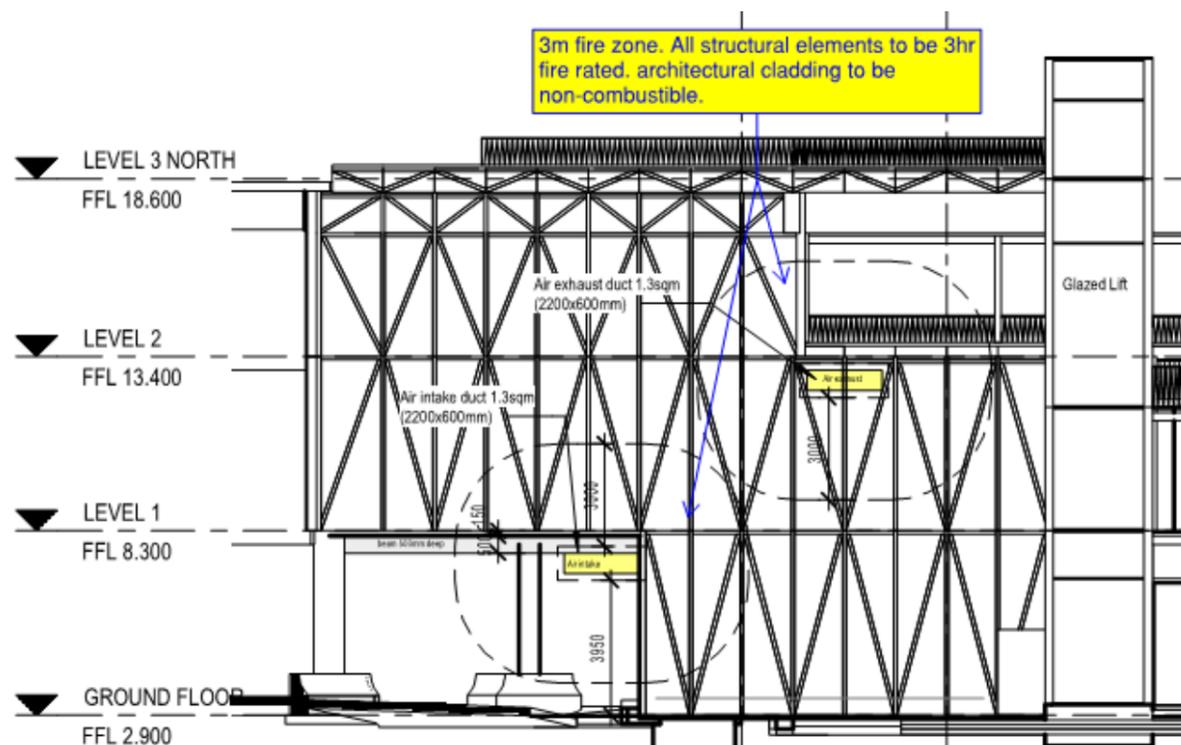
Substation 4 Chamber Substation Façade Louvres, North Elevation
